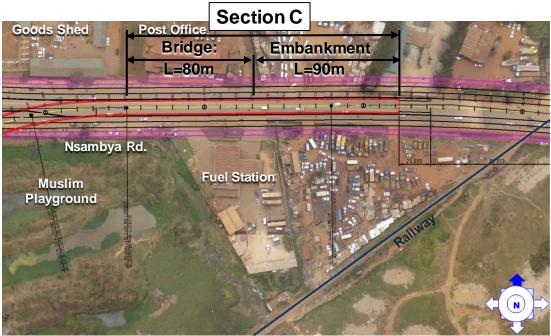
Section C: Straight section at Nsambya Road Source: JICA Progress Report 2
